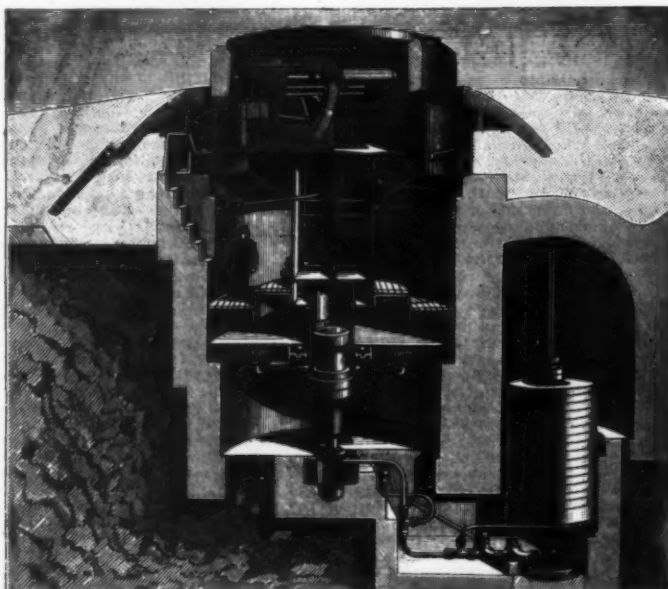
BUSSIÈRE'S HYDRAULIC DISAPPEARING TURRET.
